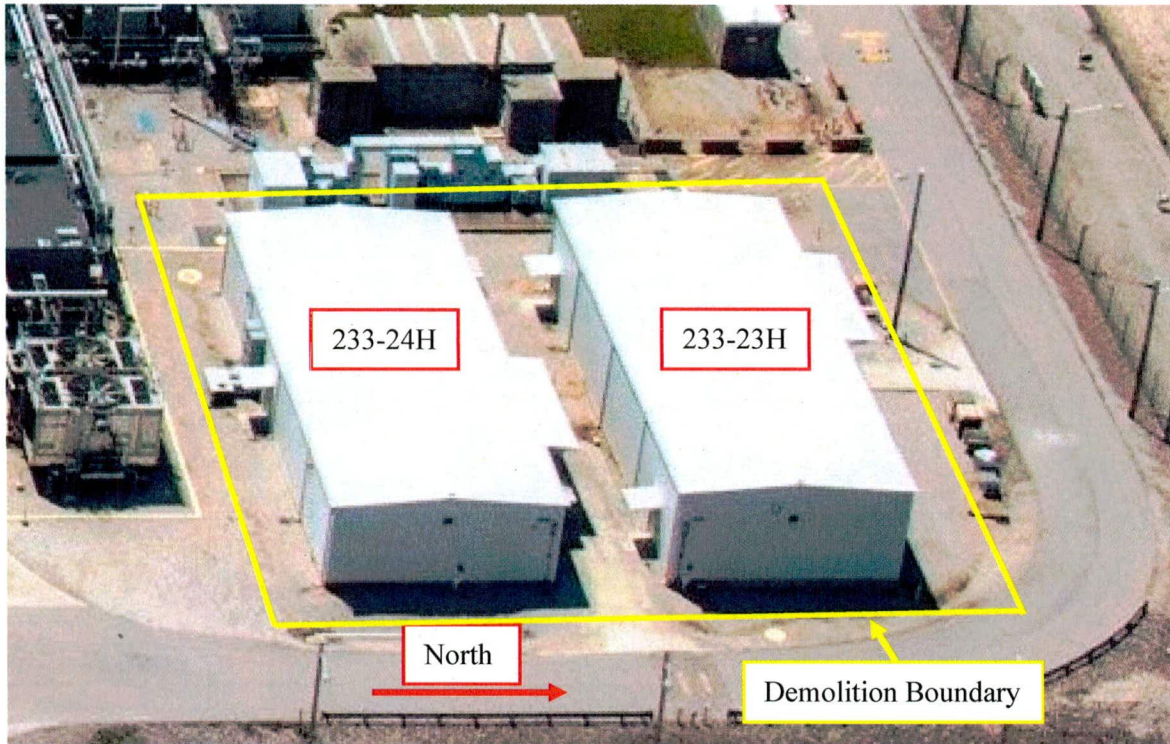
Aerial of Buildings 233-23H and 233-24H Looking West
